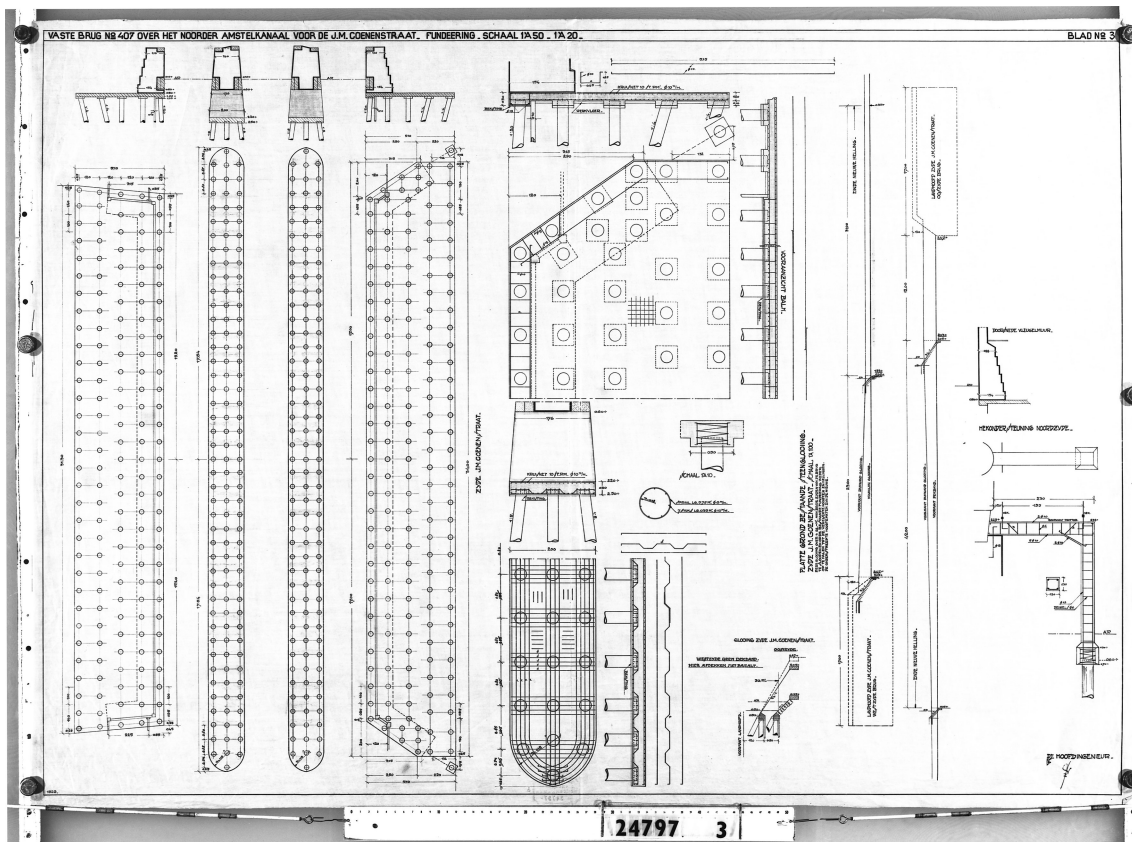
Floor plan Bridge 407 (1925) in Amsterdam (Gemeente Amsterdam, 2021)
